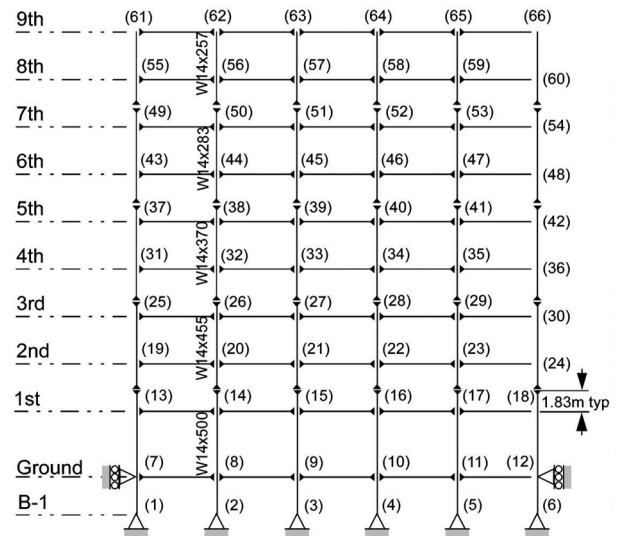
Nine-story benchmark building, north–south moment-resisting frame
